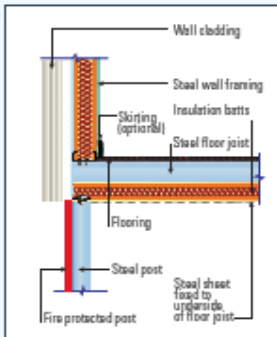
Suspended steel floor system, unenclosed, BAL-FZ
